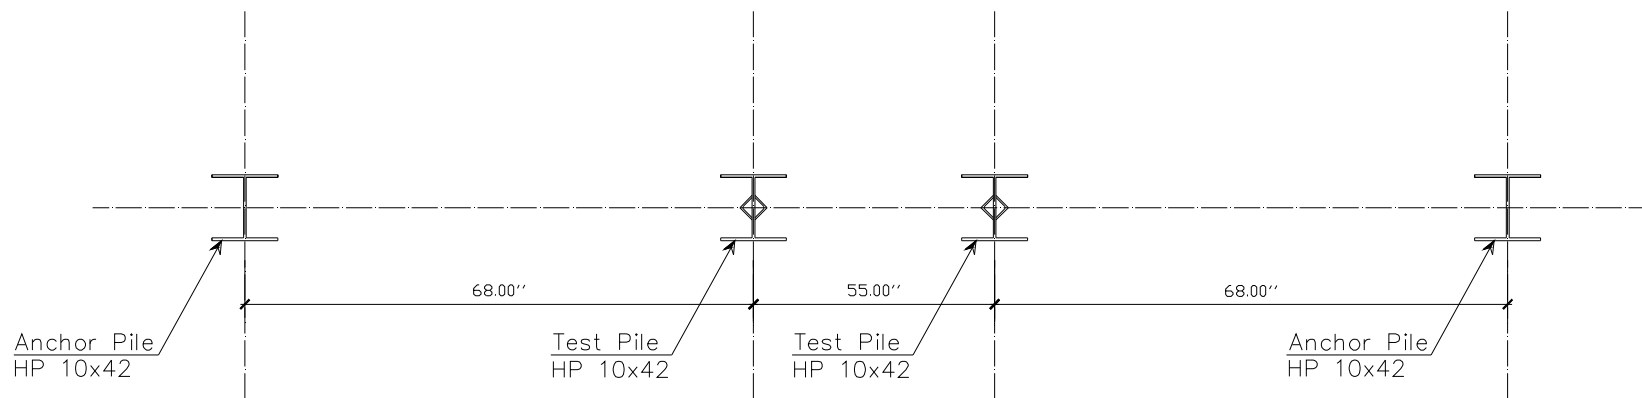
Configuration of the Test and Anchor Piles used for ISU6 and ISU7
